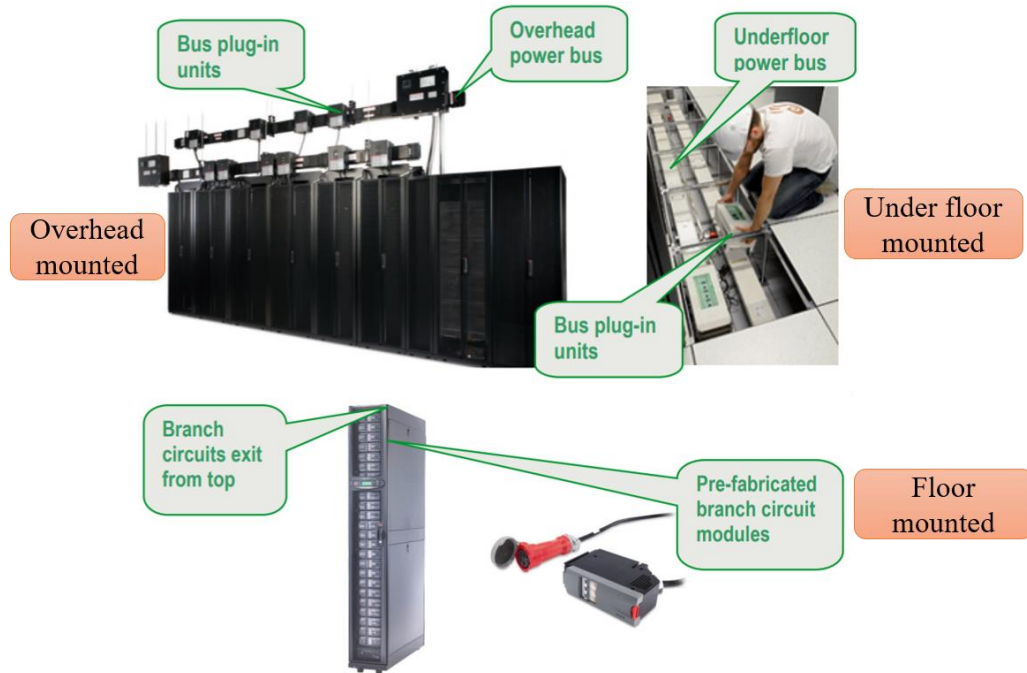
Examples of Under floor, Overhead and Floor mounted within a data center
